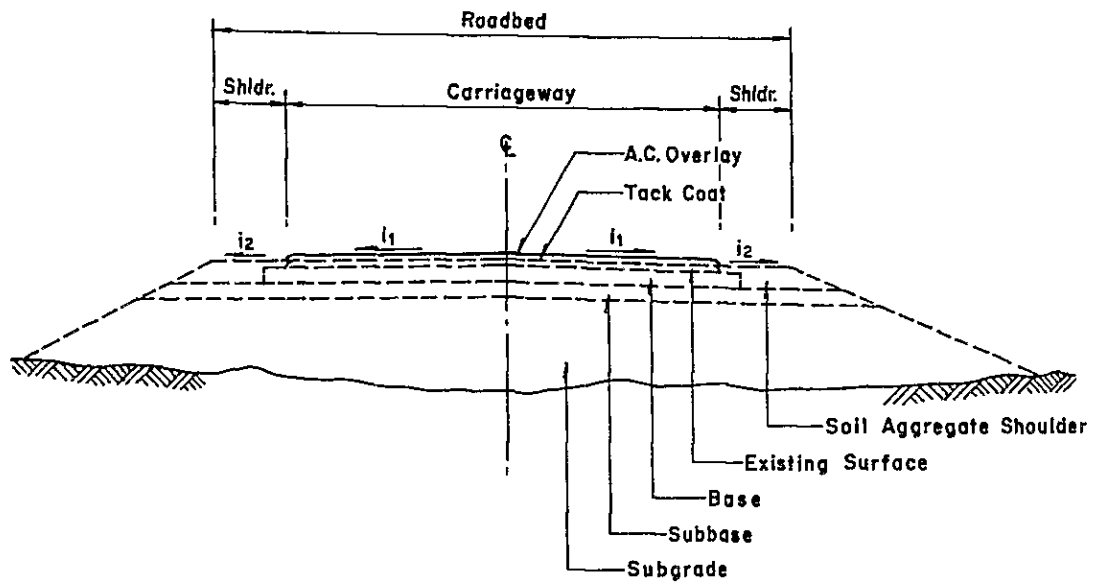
TYPICAL OVERLAY AND RECONSTRUCTION SECTIONS
